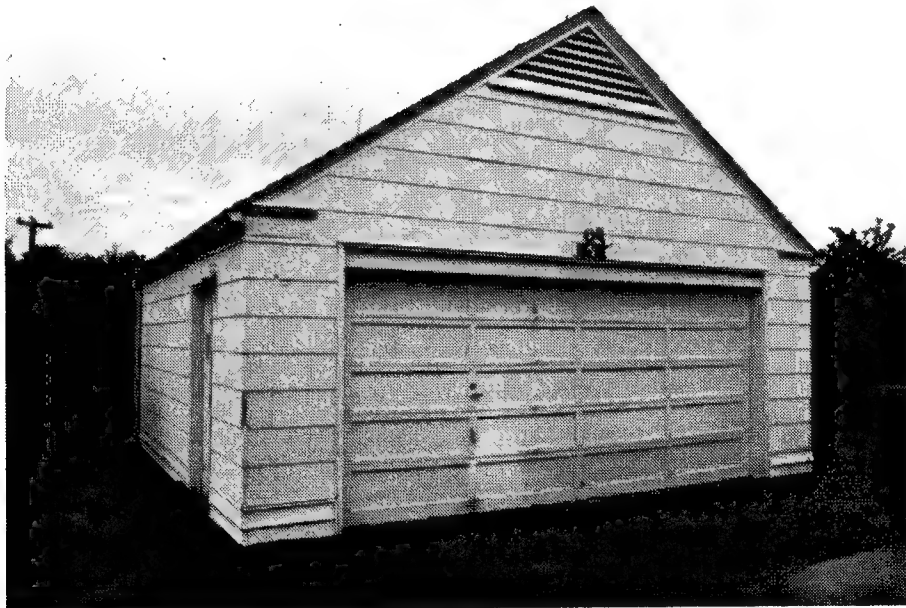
Building 114-31: Double Detached Garage at Staff Residence.
